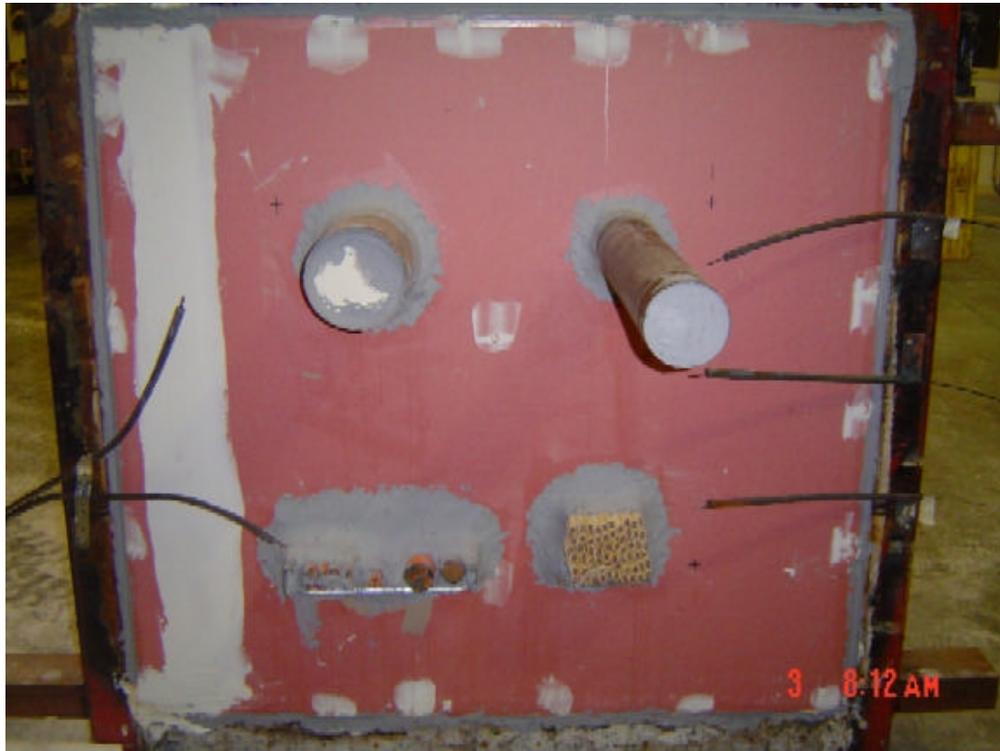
Exposed face of test specimen prior to commencement of the fire-resistance test
